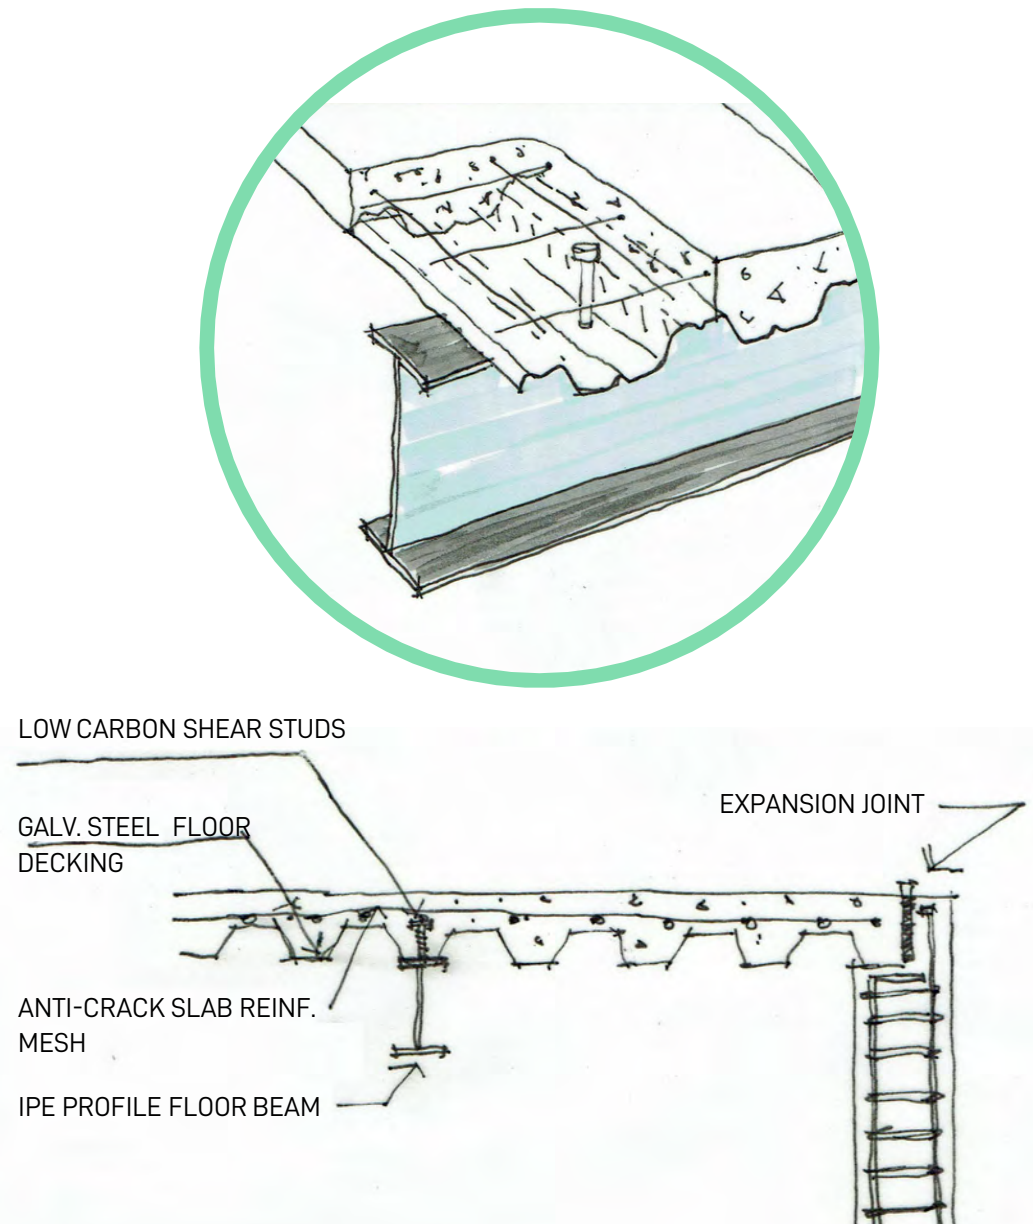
Typical steel decking concrete floor detail (Author, 2020)
